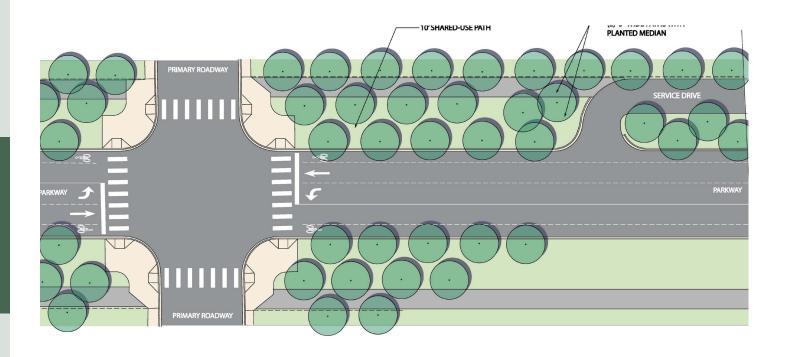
Typical Plan for Parkway/Service Drive Return Connection
